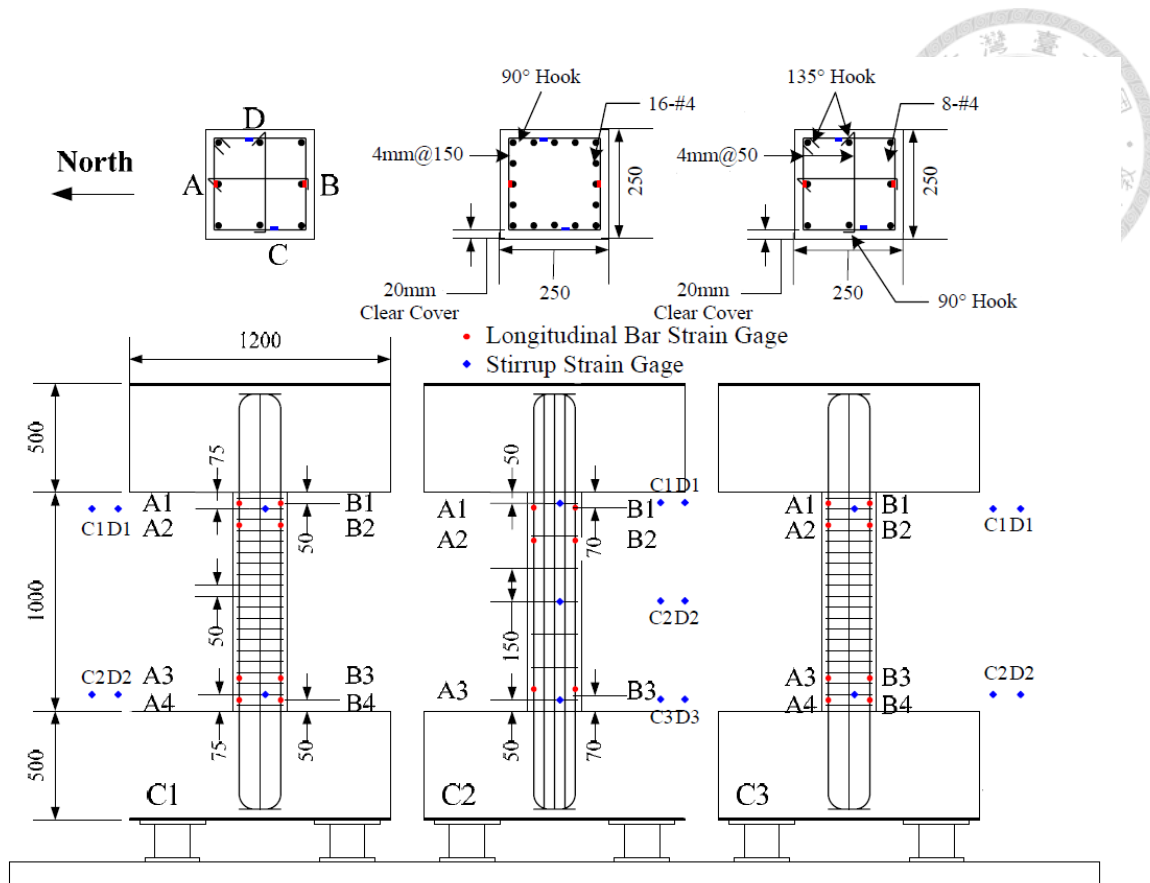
Shaking table test T1 specimen design layout (Su 2007)
